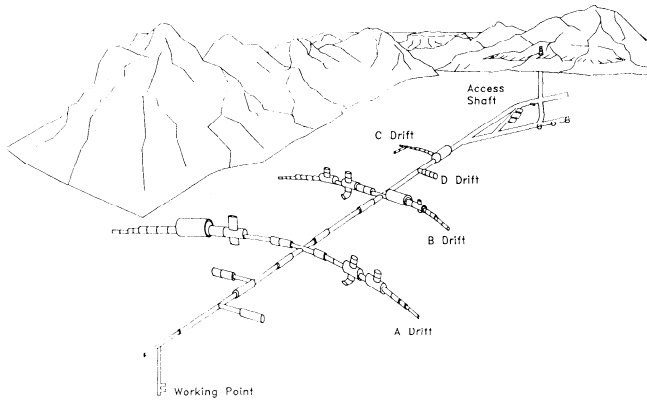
Dedicated underground structures test (permission: DNA).
